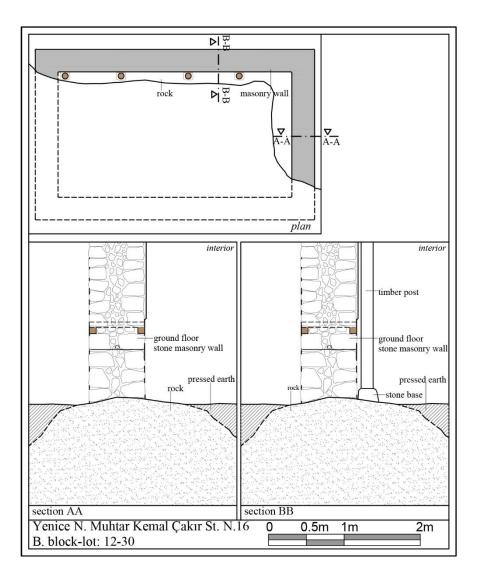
Drawing of rock used as a part of foundation (Yenice N. b.blok-lot: 12-30)
